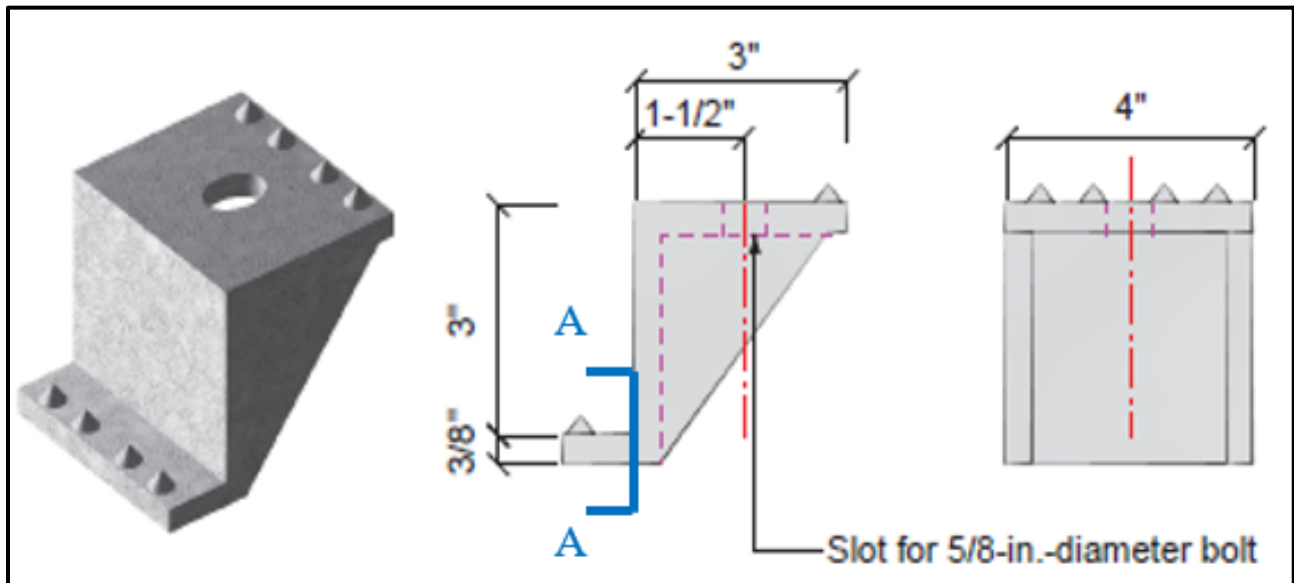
Bracket Plate Used to Connect Deck Panels to Girder [20]
